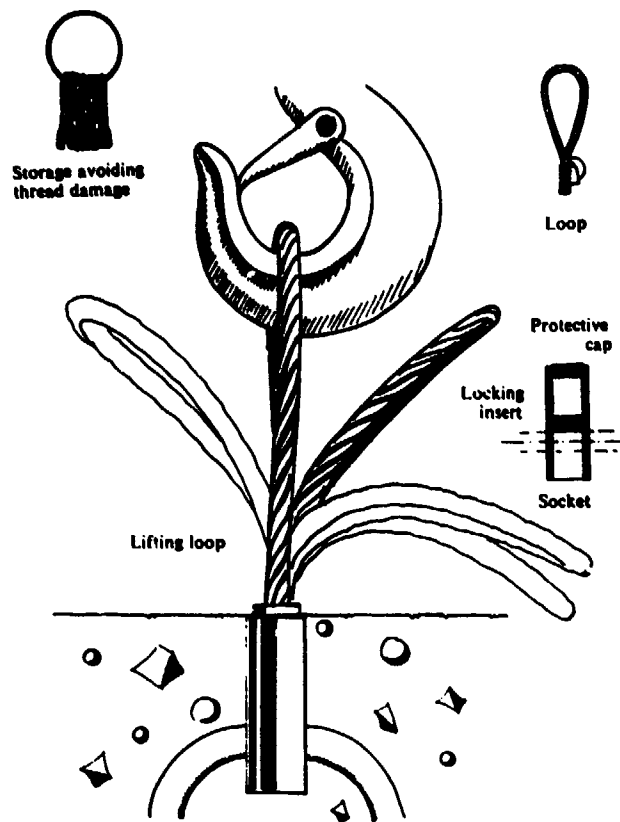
Embedded loop providing lifting attachment (Reprinted from "Precast Concrete Production" by J. G. Richardson)
